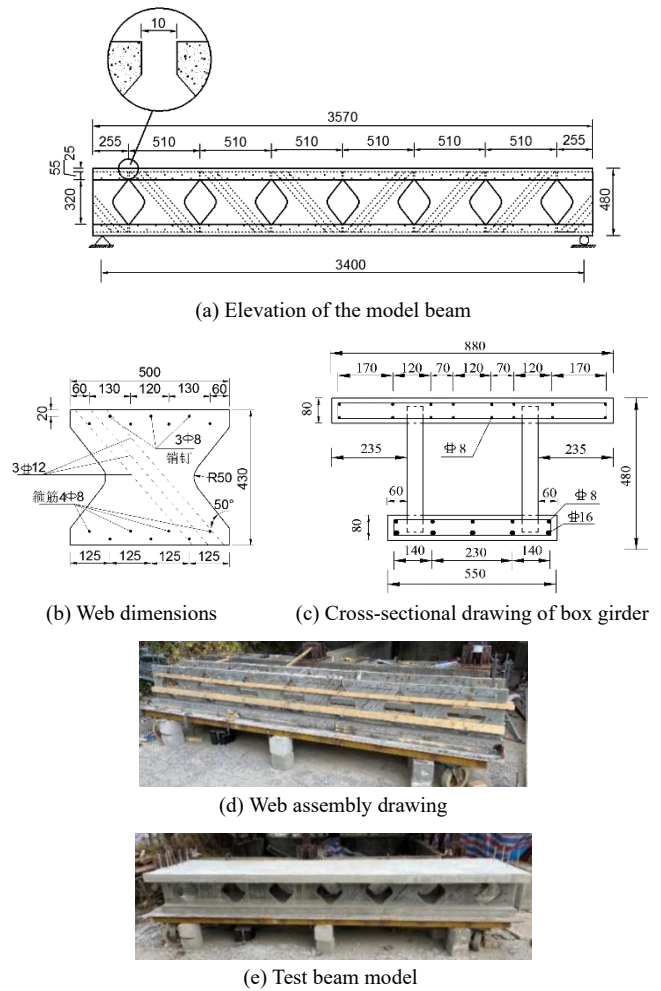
Structure diagram of butterfly web box girder (unit: mm)
